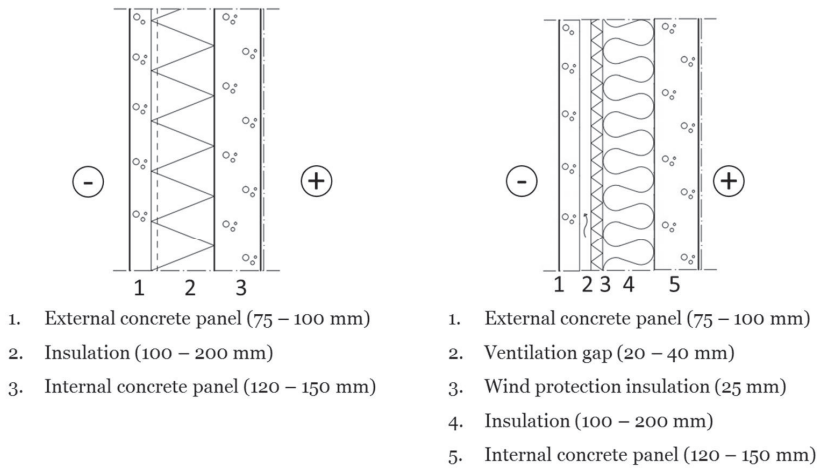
Cross-section of ventilated and non-ventilated sandwich panel facades.
